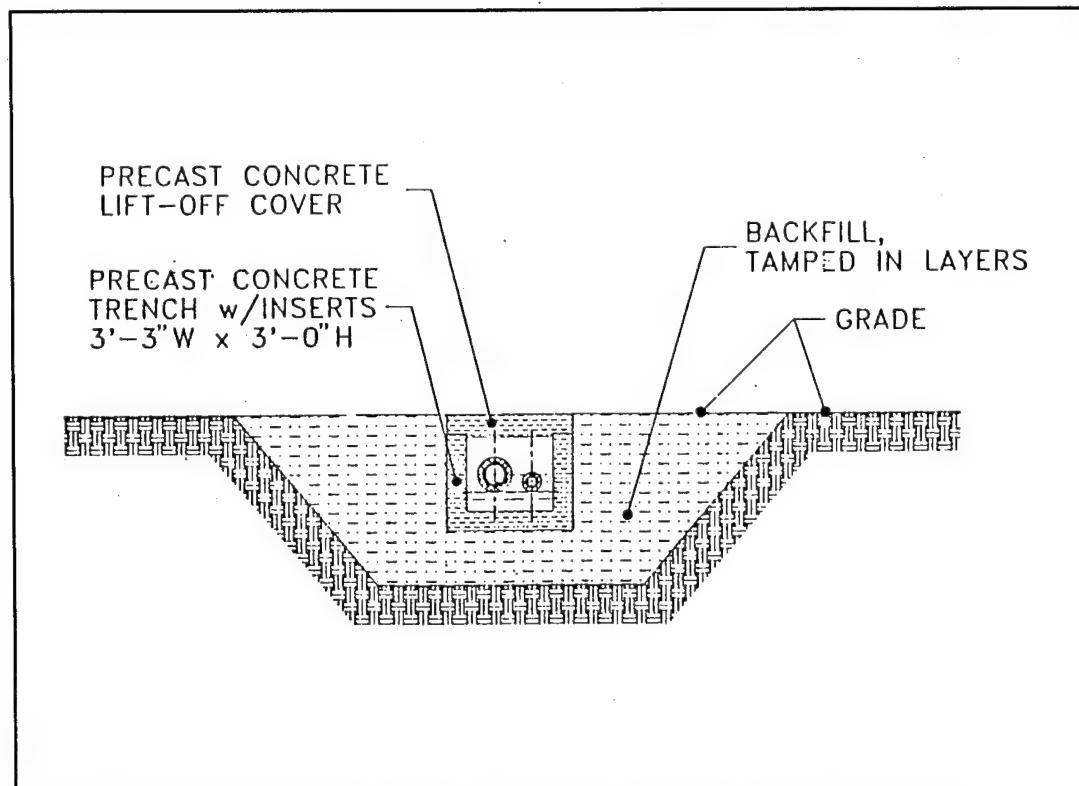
Steam distribution system design using shallow trench/walkway construction.
